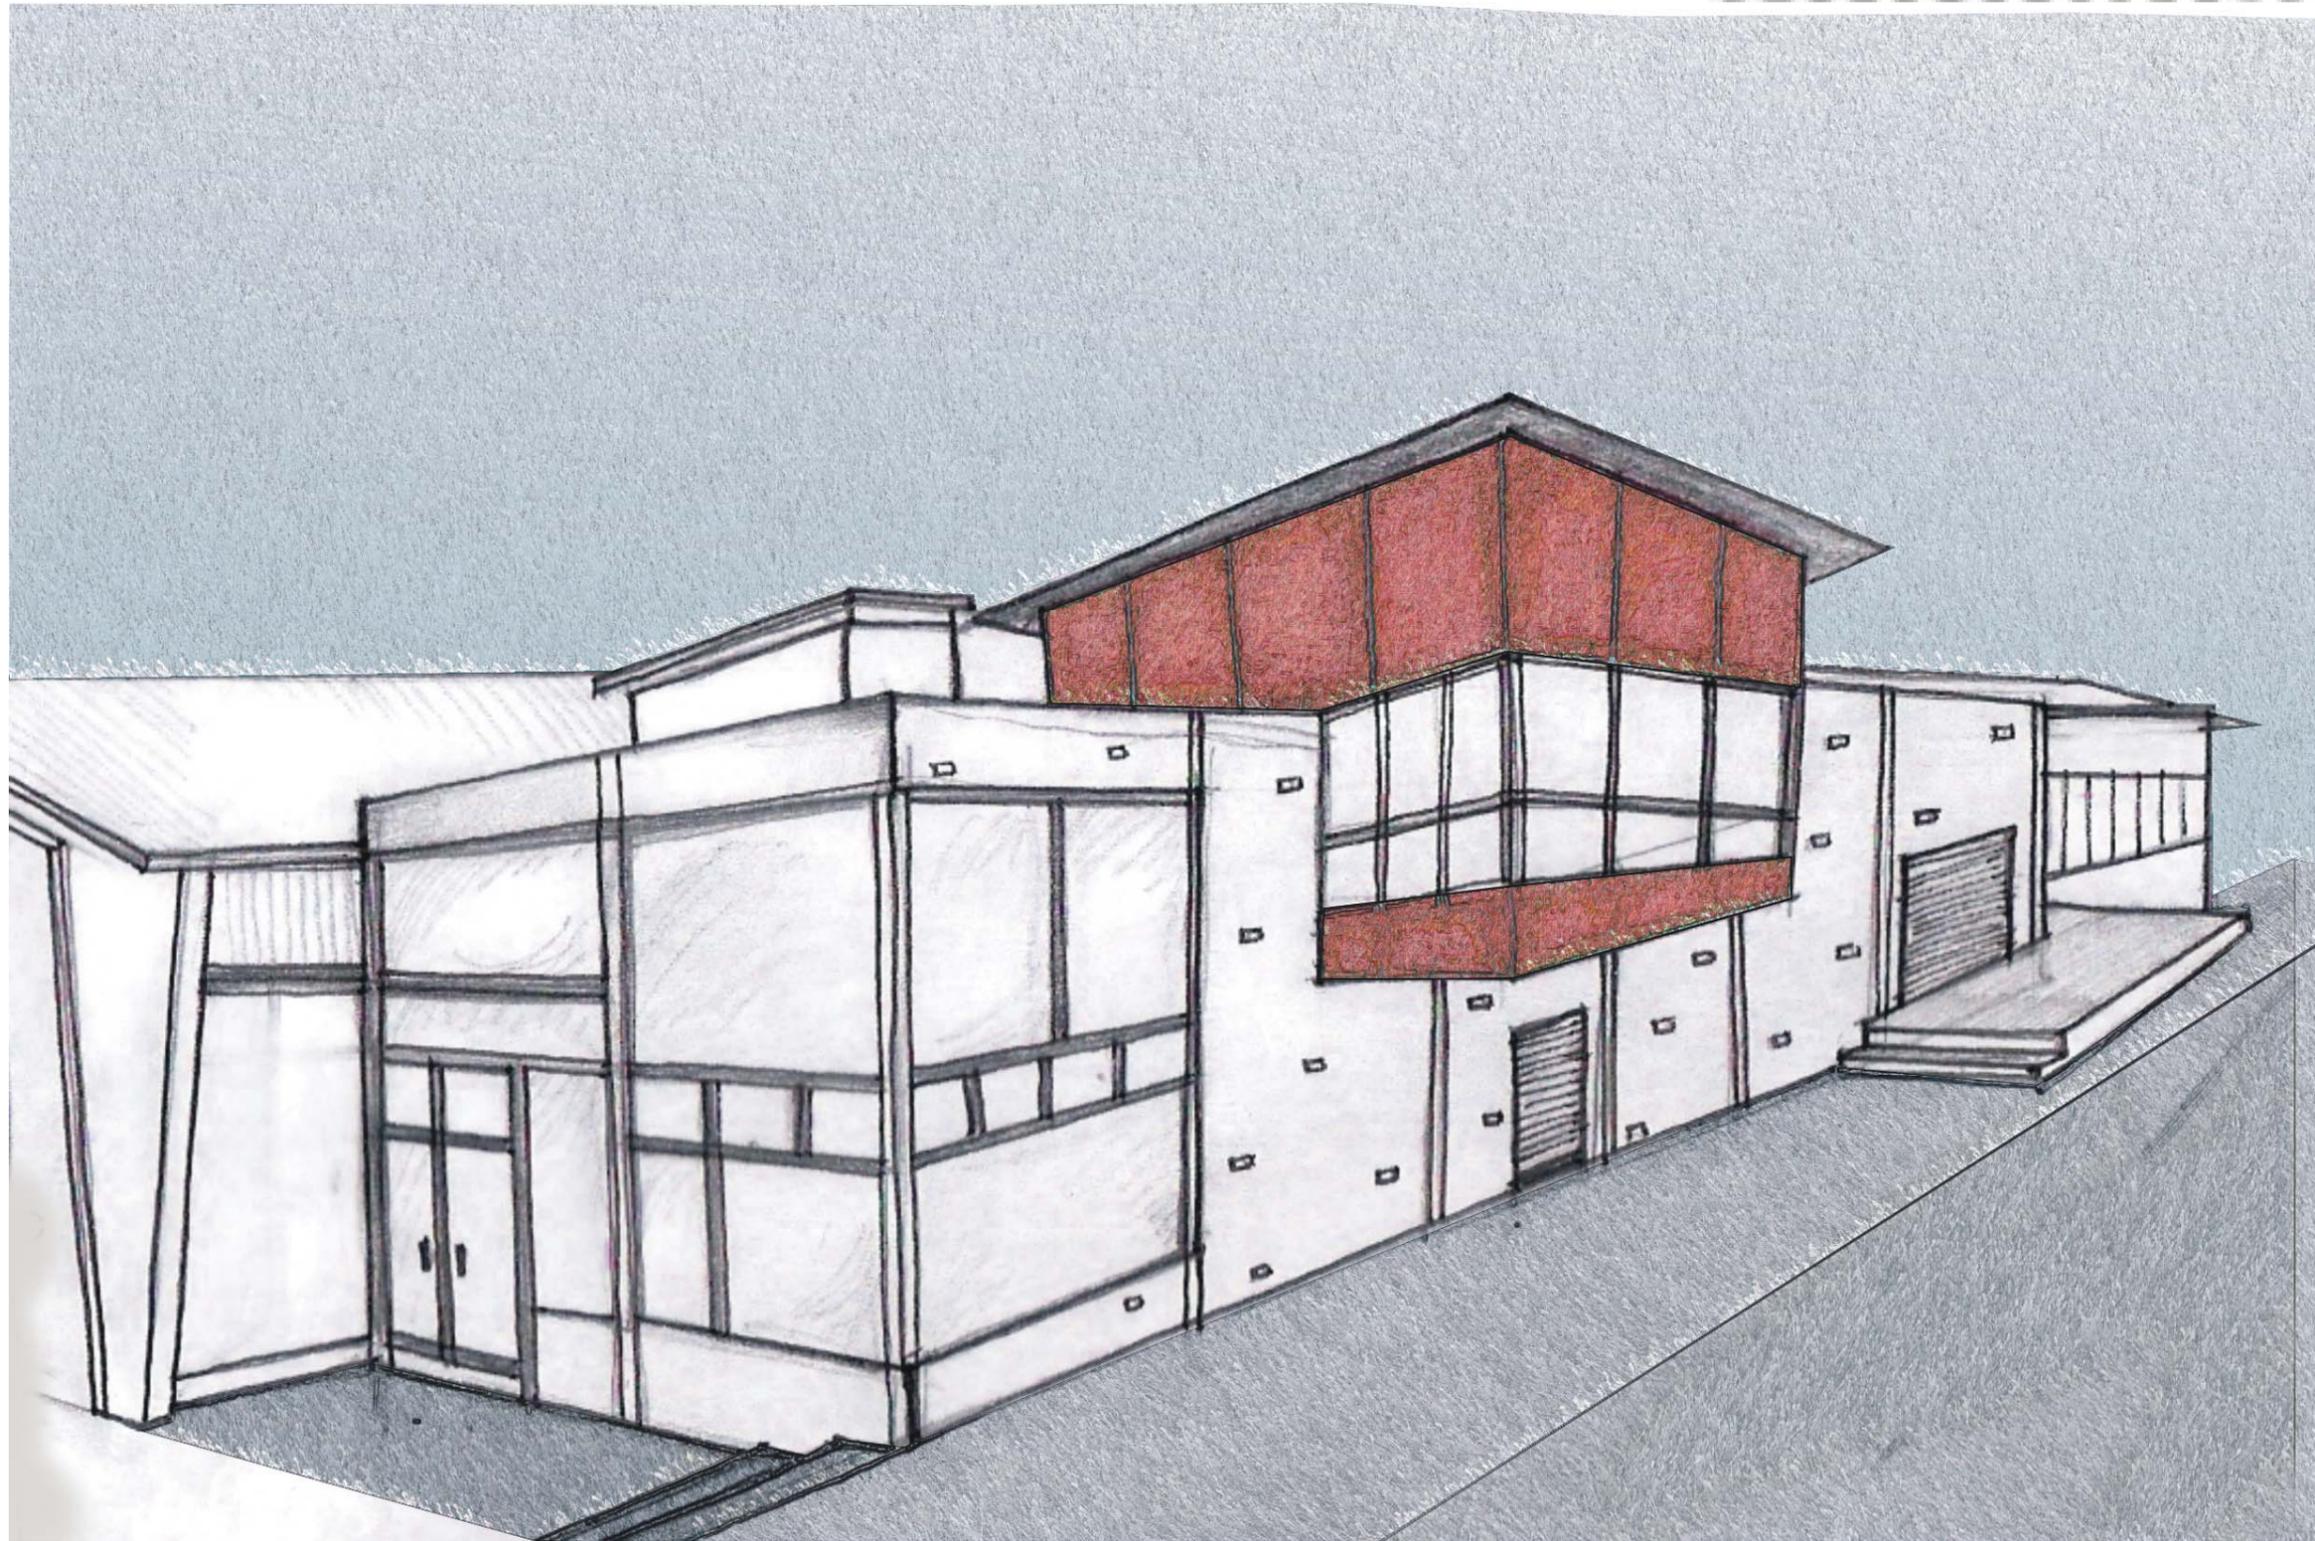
Sketch perspective of the new addition on the east of the existing Masker Building.
